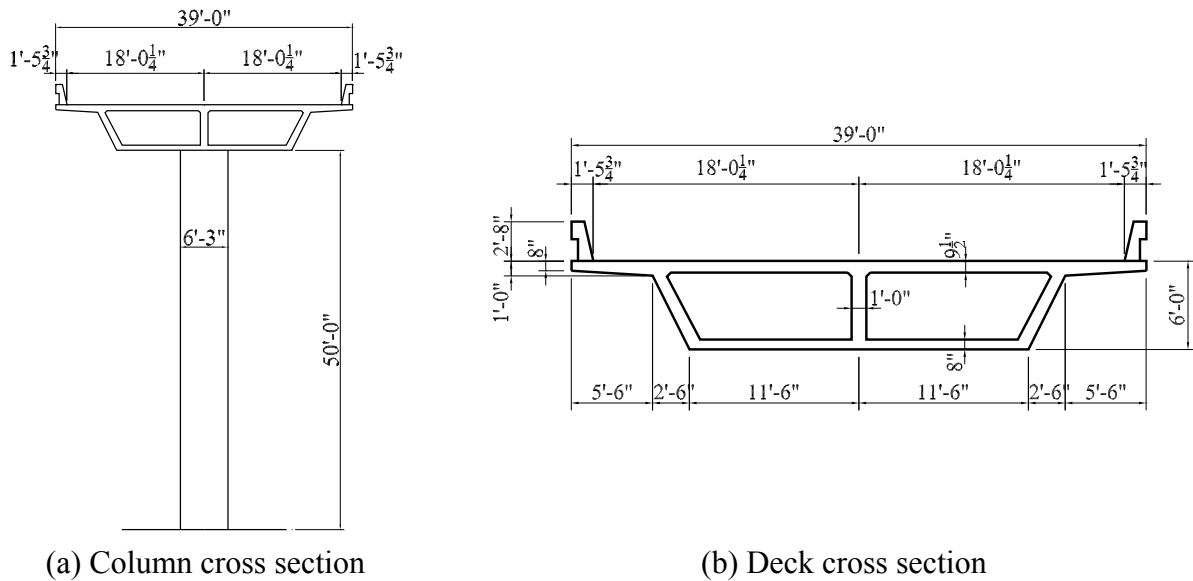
Column and deck cross section of bridge Type 11 (Ketchum et al. 2004).
